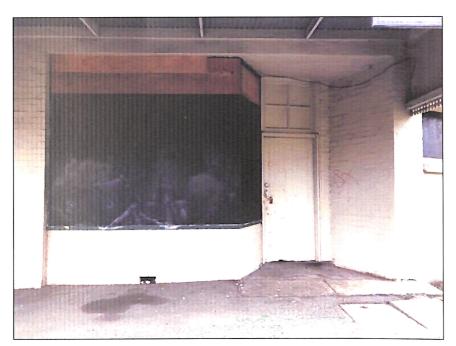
The second shopfront on the east side of the Bedford Street elevation. The entry retains original door and window joinery, though the door light has been sealed.
